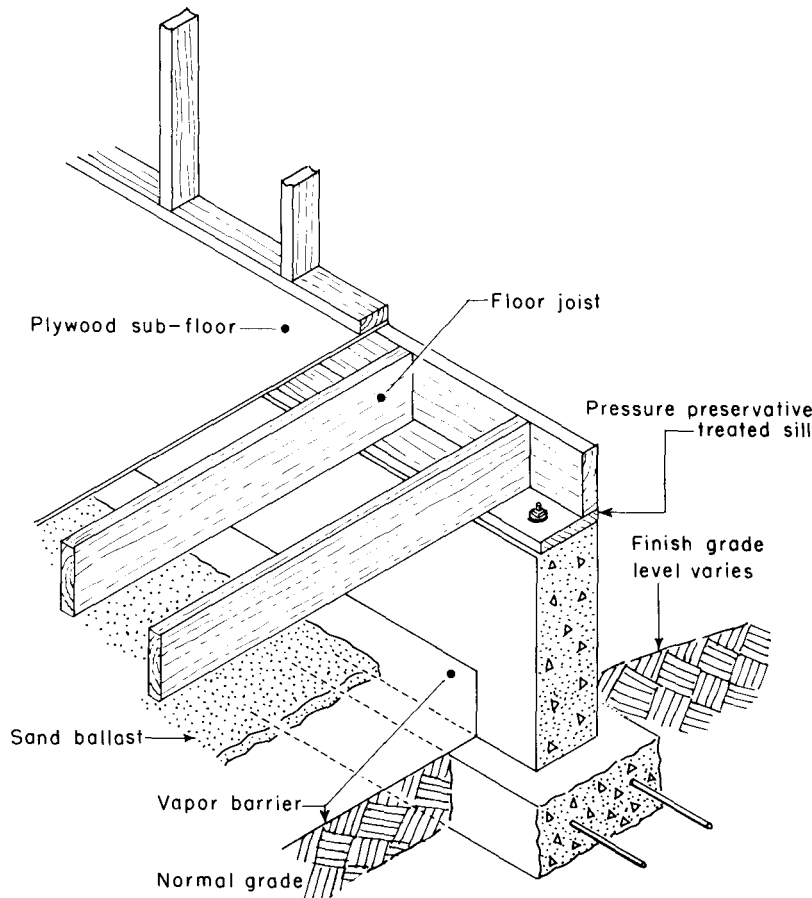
The crawl-space floor is the most common floor design used in the Southwest, where terrain and soil conditions present technical problems.
